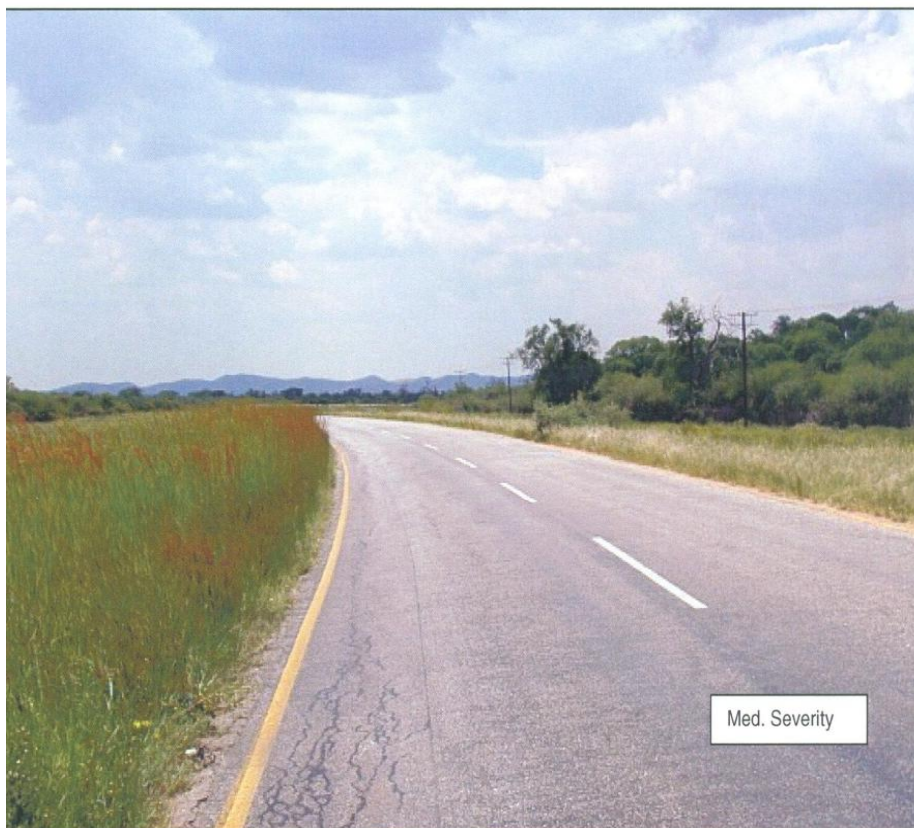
Edge Cracking (Distress Type 7) and corrugations (Distress Type 7)
